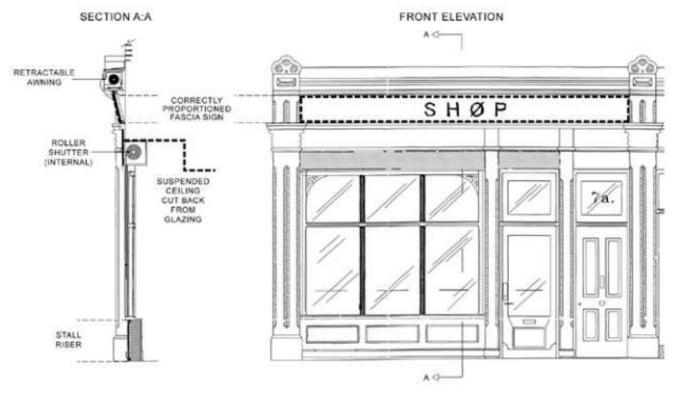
Example of a good shopfront elevation and section from Camden Planning Guidance document CPG 1: Design (Figure 9, page 66).
